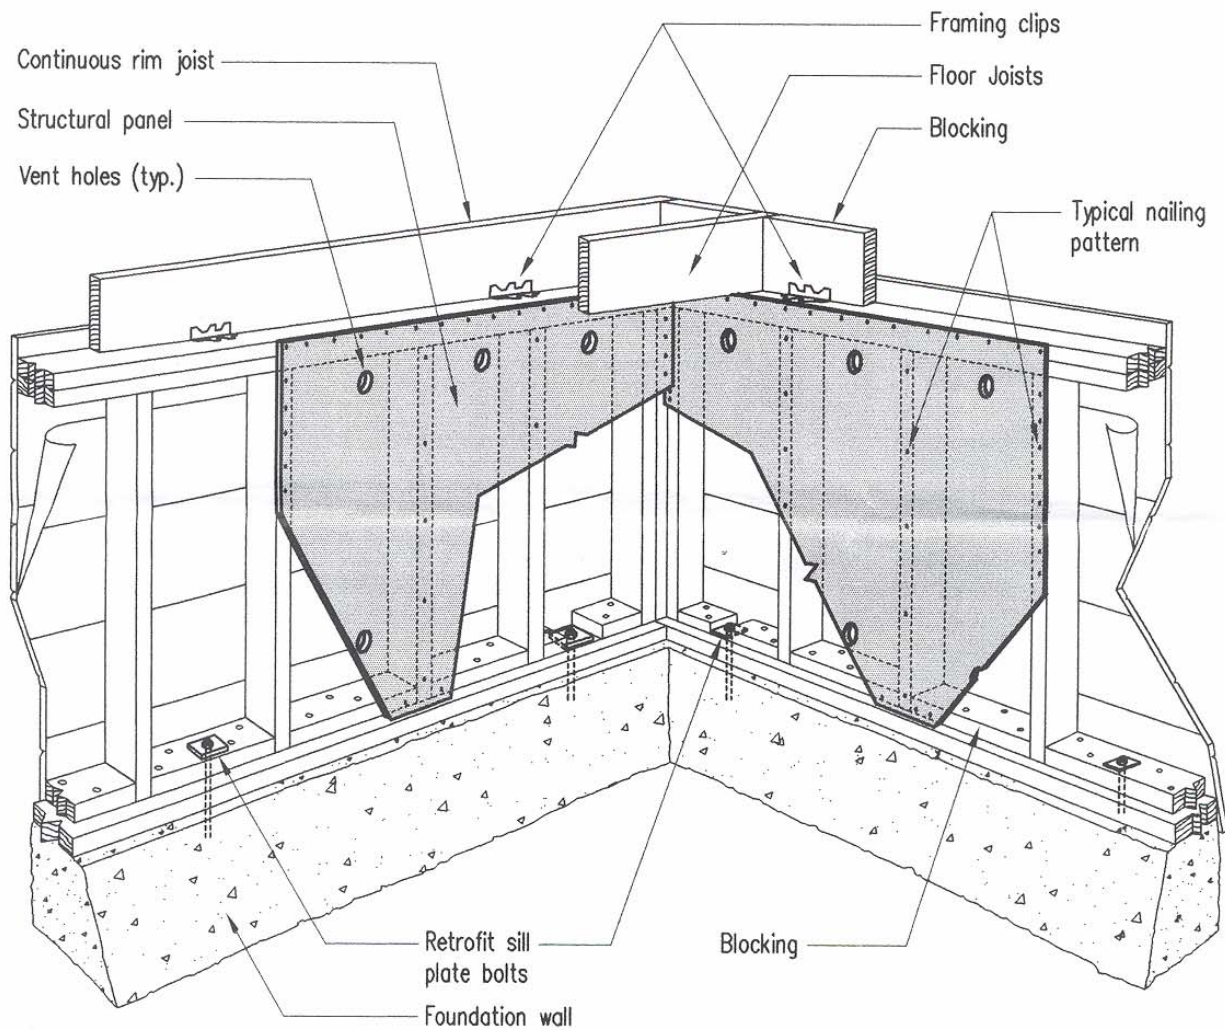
Side view of a typical retrofit wall section. Numbers refer to the drawings on the drawing details to meet various conditions.
